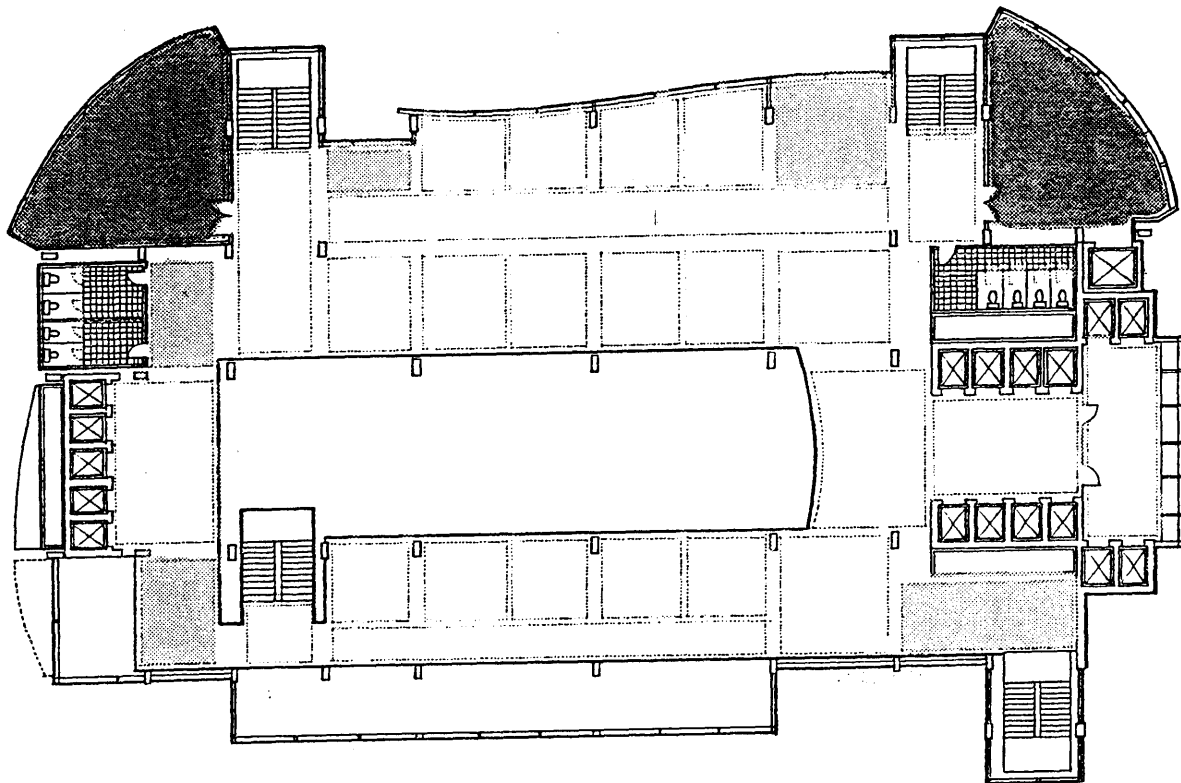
Intermediate Floor Plan, showing corner elements and South Mezzanine
